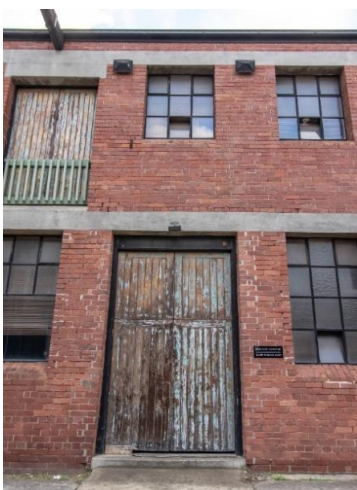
East elevation of Building 3, retaining original multi-pane metal-frame windows, exposed concrete lintels, regularly spaced metal vent covers, an original timber hoist and original timber loading doors on each level around the middle. (Source: Context, May 2020)
